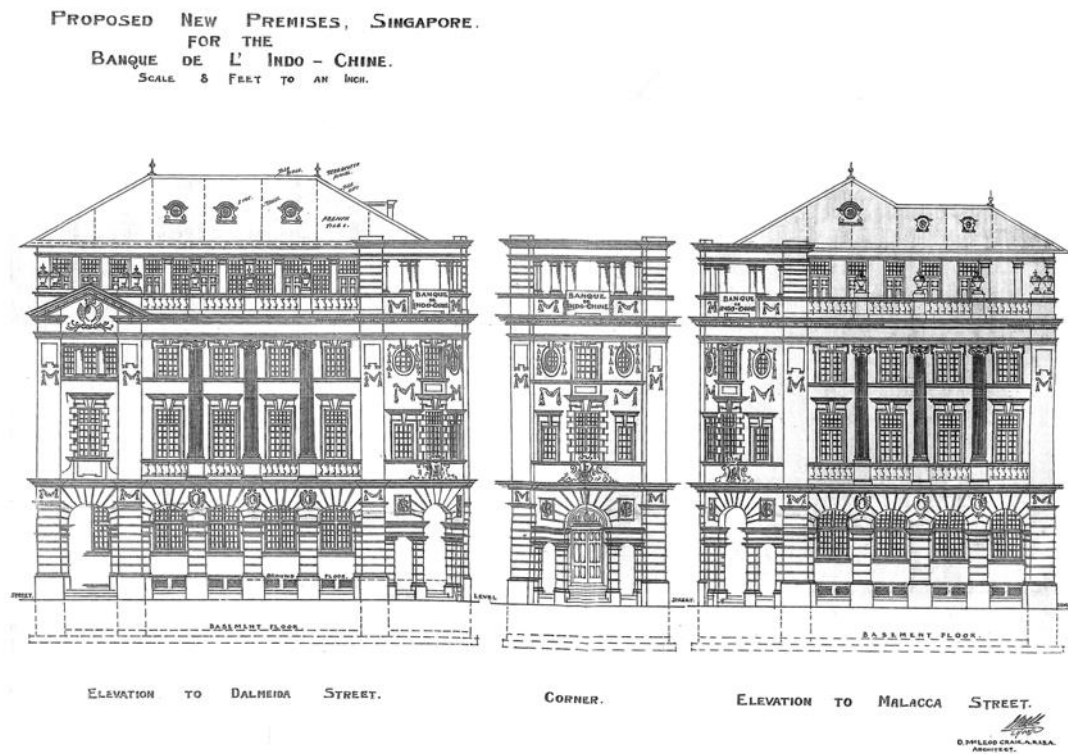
David McLeod Craik. Elevation for the Banque de l'Indochine, Singapore, 1912. NAS NA 309, Building Plan 796.
